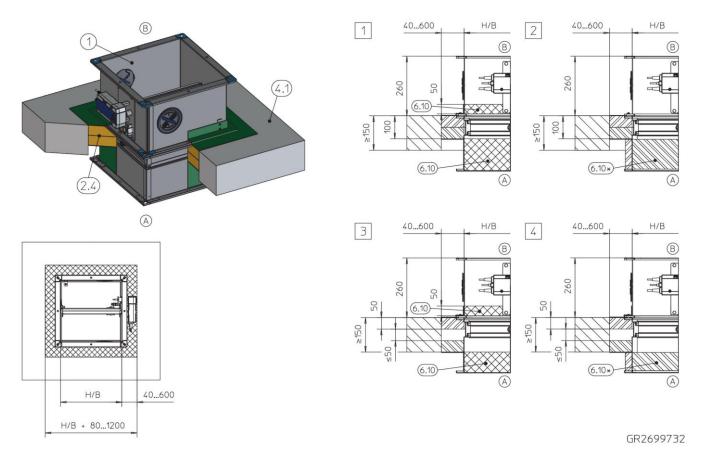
Dry mortarless installation into a solid ceiling slab, with a fire batt, upright
